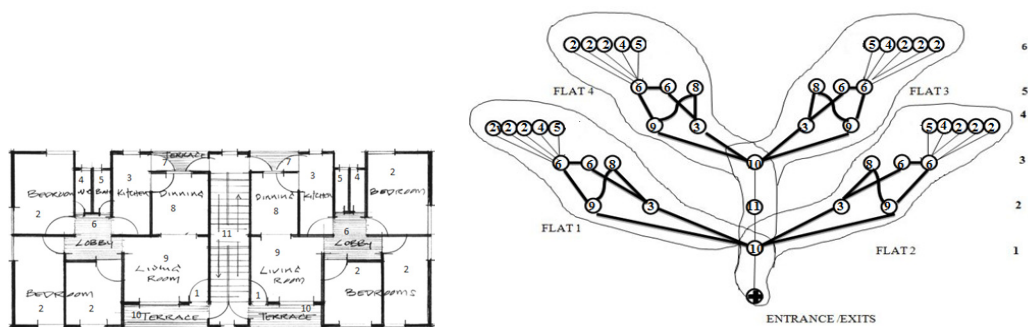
floor plan and J-graph of an apartment house (Source: Ekhaese 2011)
